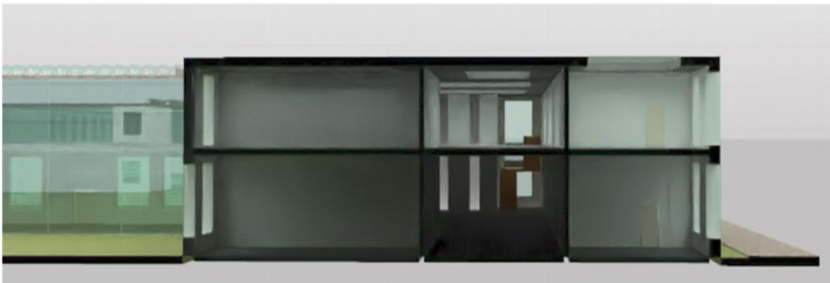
Luminance Sections Revised - Classroom along with Corridor(South West Corner)
